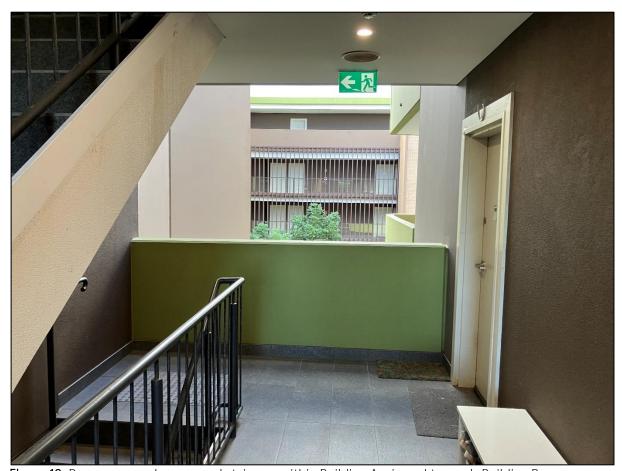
Breezeway and communal staircase within Building A, viewed towards Building B
